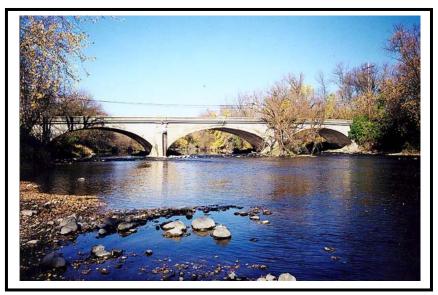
4-41: Multi-Span, Closed-Spandrel, Concrete Arch Bridge
